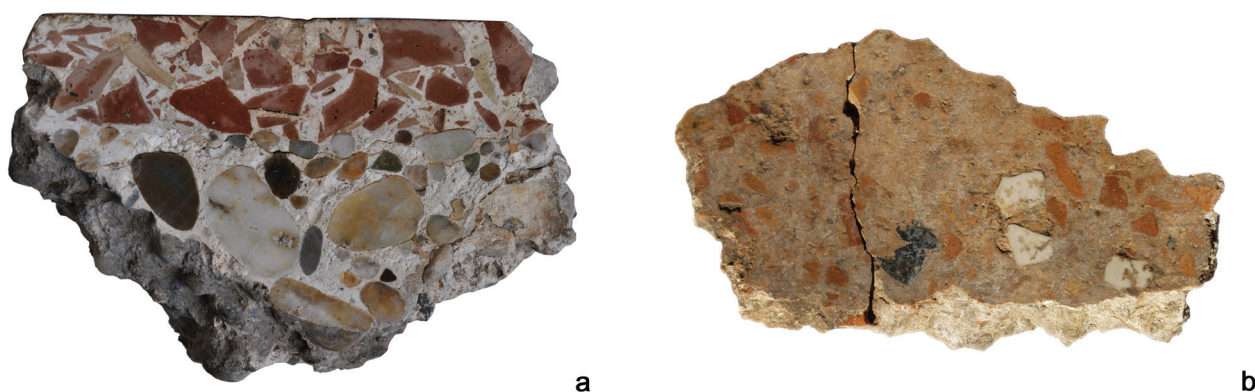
Bratislava Castle – Winter riding school. Fragments of the third type of floor (*terrazzo* type). – a: Section. – b: Surface (Photograph: P. Horanský; © MÚOP, Bratislava).
